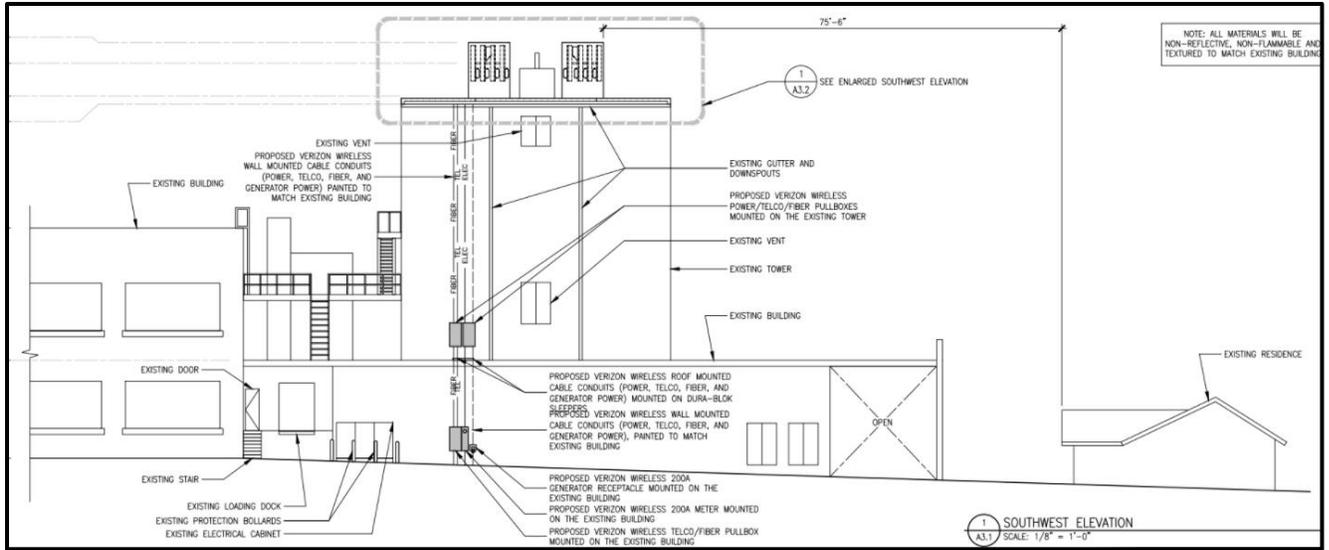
Proposed Southwest Elevation (Sheet A3.1)
